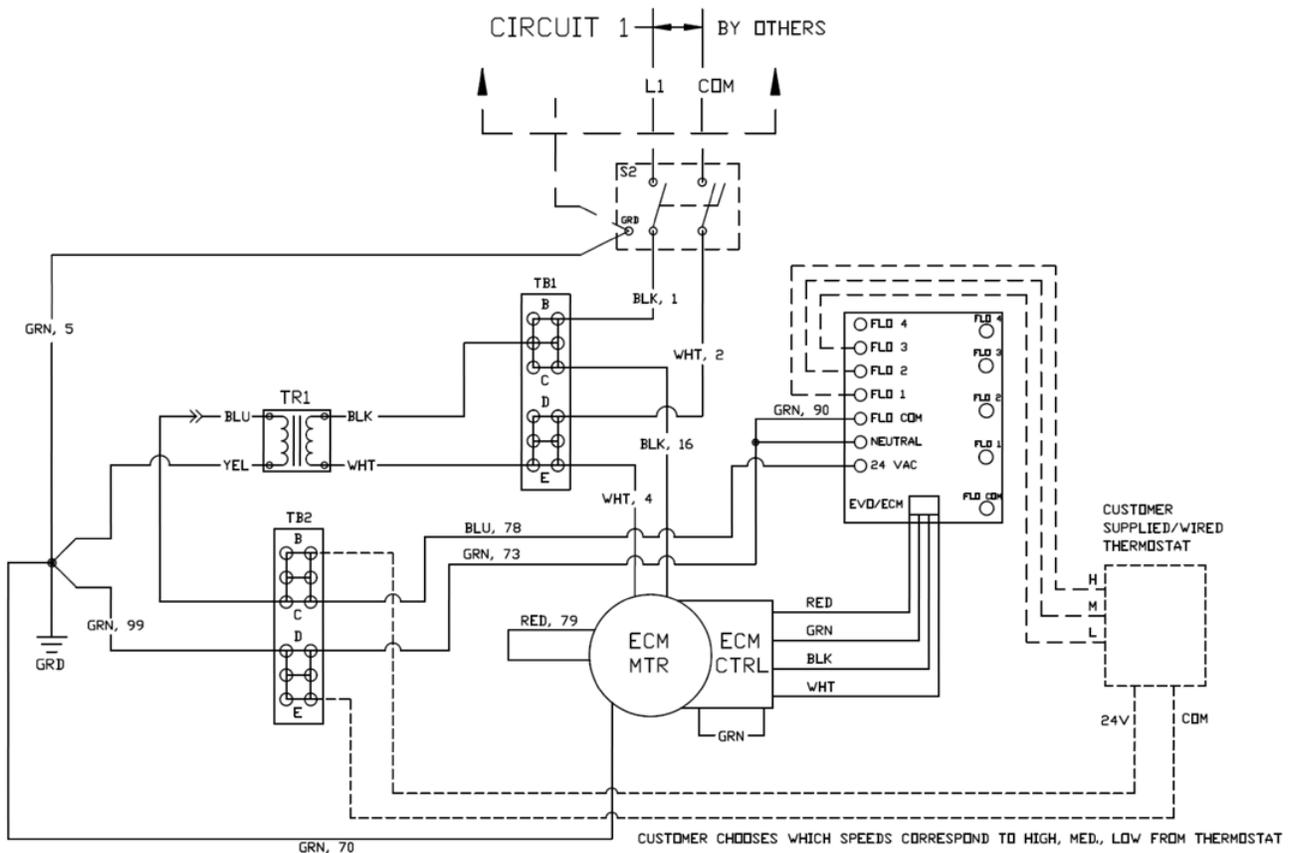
Single Motor EVO Board Bypass Wiring Detail for Large Cap Unit
